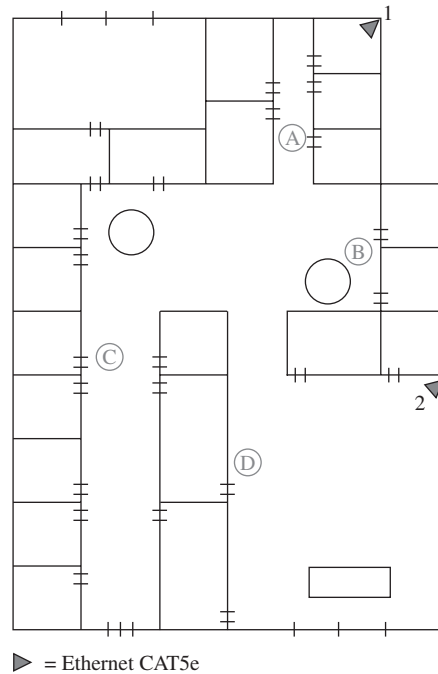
The floor plan of the building being surveyed for a wireless LAN.
